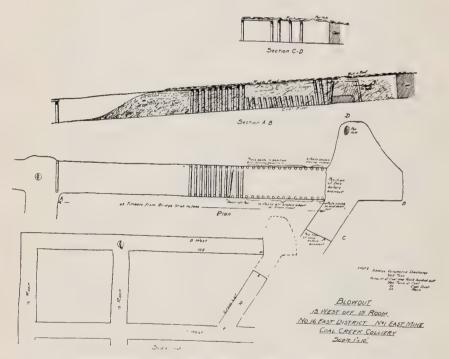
Blow-out, 18 West off 15 room, No. 16 East district, No. 1 East Mine, Coal Creek.
